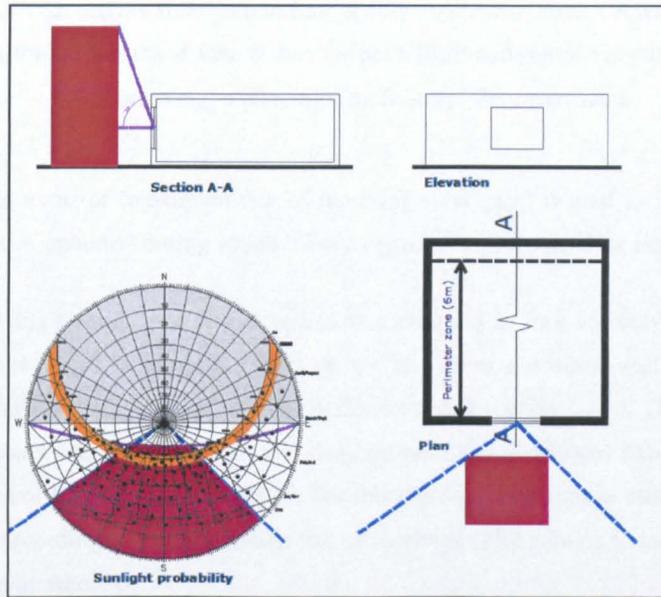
plan, elevation, section of a classroom which is faced to the south and is overshadowed a building
